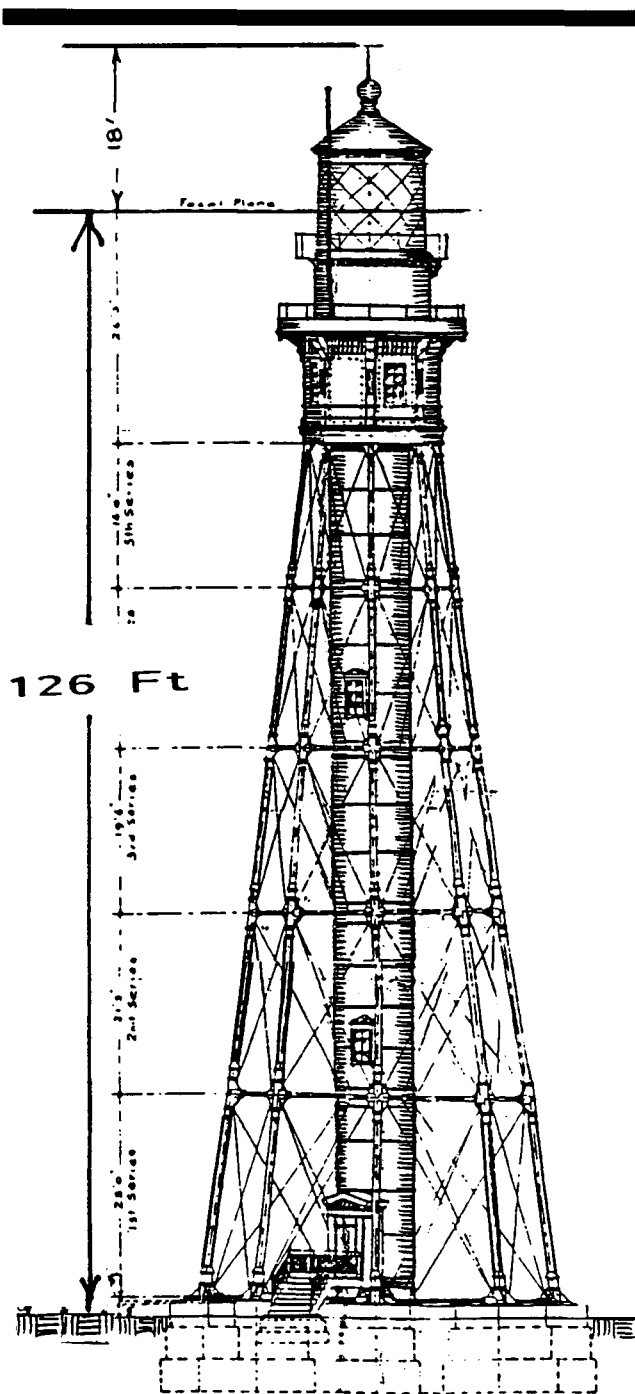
David F. Butler's 1904 plans for Hillsboro Lighthouse (4).
